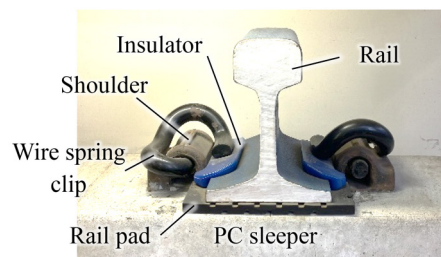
Boltless rail fastening system using wire spring clips (e2009 type)
